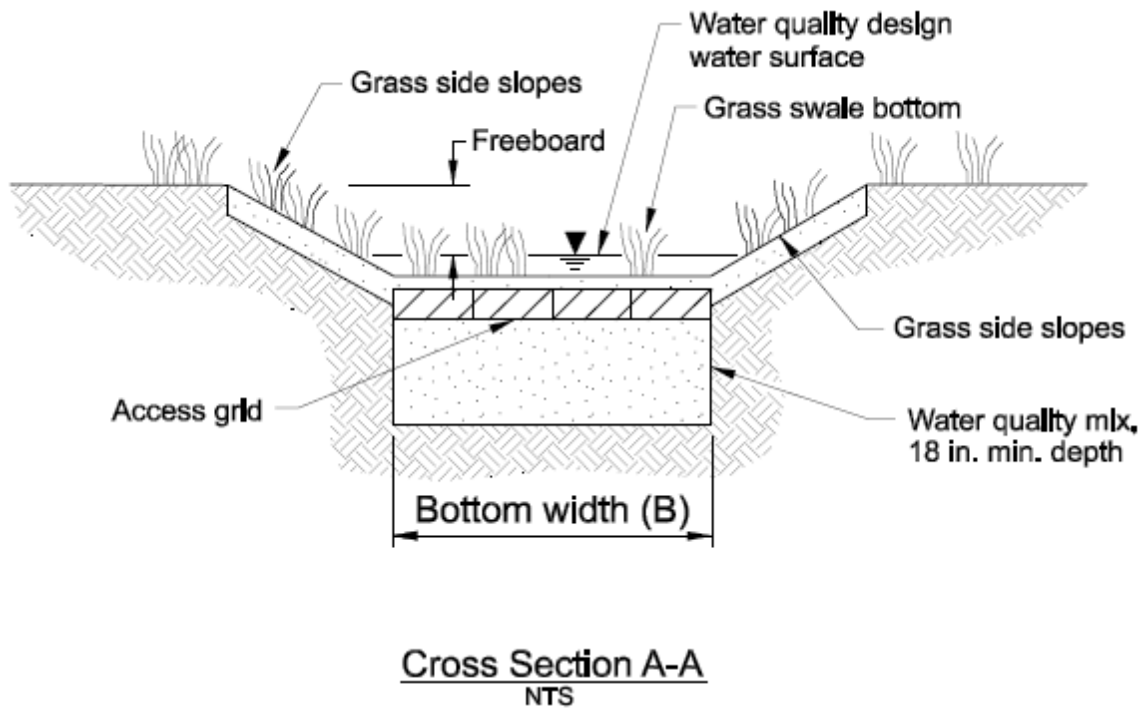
Typical cross section of a trapezoidal bioswale design (Adapted from ODOT, 2014).
